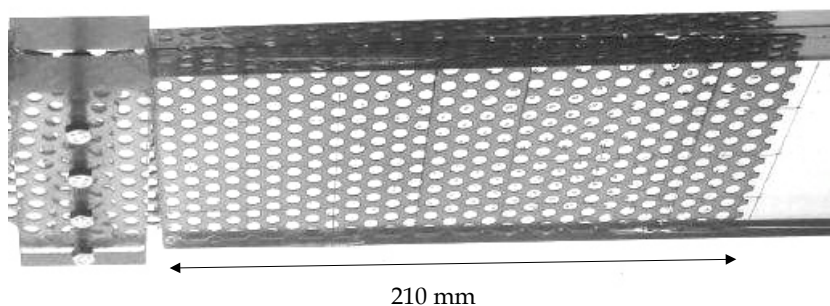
Close-up view of specimen connection with 210 mm embedded steel perforated plate on each side
